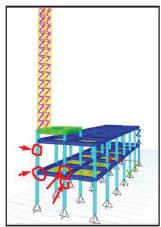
Graphical Representation of Crack Locations in Columns at Site No 04
